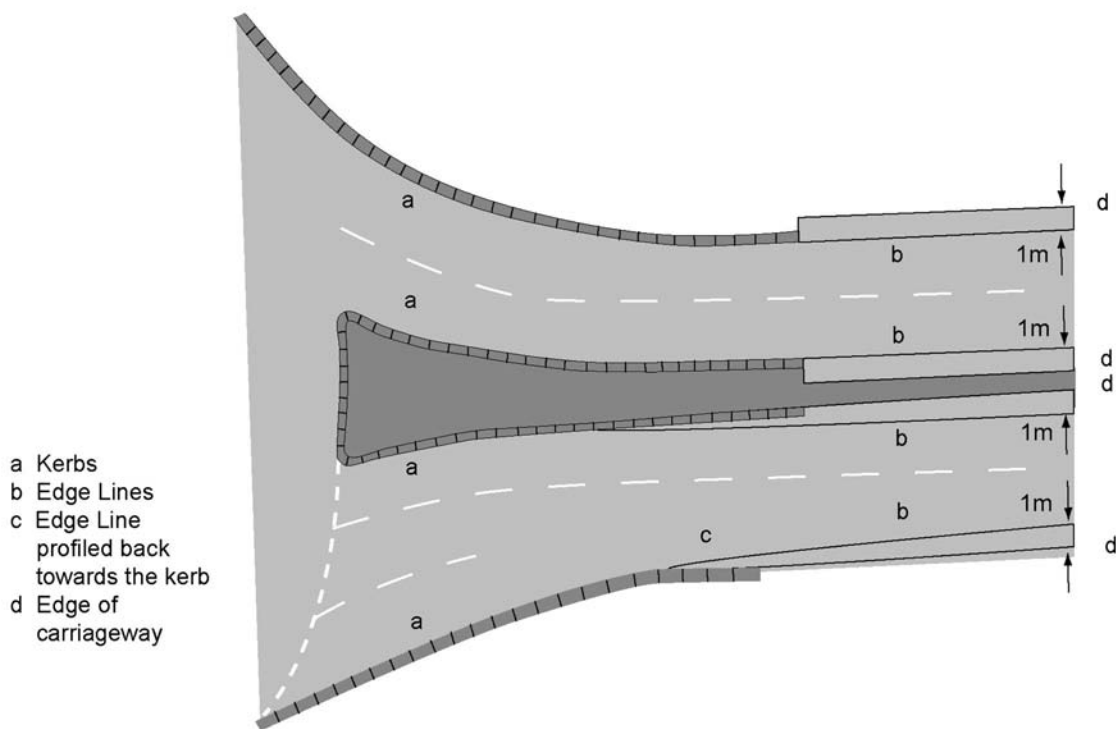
/11: Method of Terminating Edge Strips on a Dual Carriageway Approach to a Roundabout
